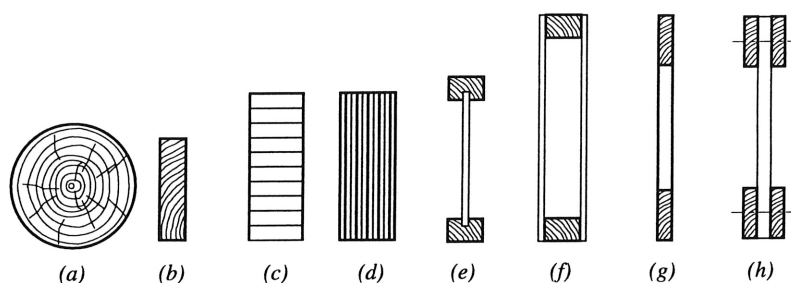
Section shapes used as purlins. (a) Round solid timber or natural timber poles, (b) solid timber sections, sometimes used in groups fixed together to act as a single unit, (c) glued laminated sections, (d) Laminated Veneer Lumber, (e) I-beams, (f) box beams, (g) trussed rafters with punched metal plate connectors, sometimes fixed together and used in groups to form a multiple truss, (h) truss with glued or nailed plywood gussets, bolted, or toothed plate connections.
